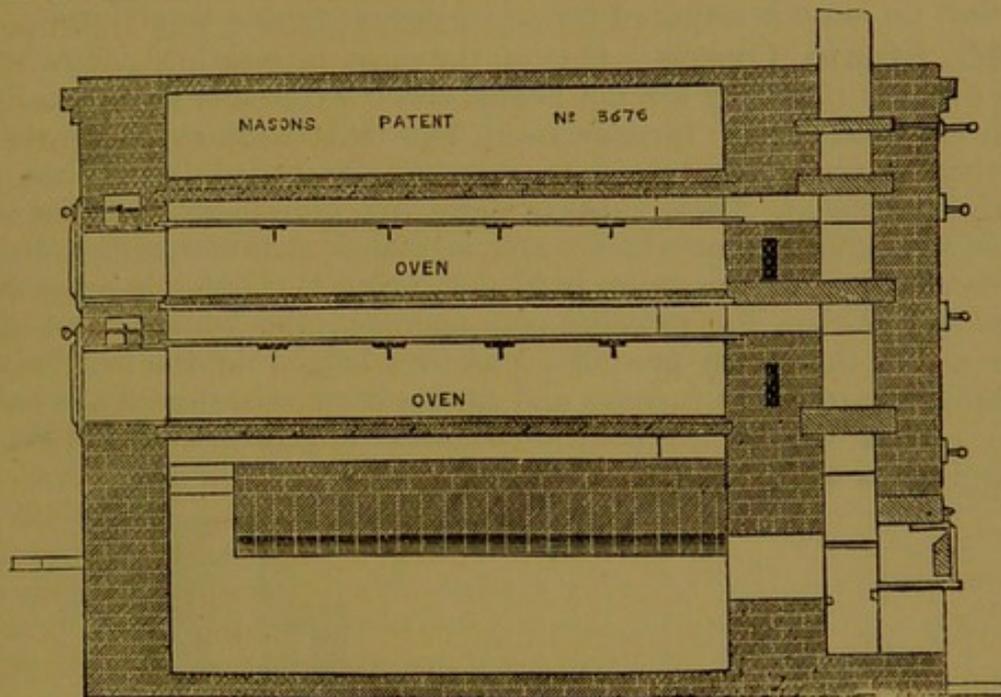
LONGITUDINAL SECTION THROUGH "MASON" TWO-DECKER OVEN.
